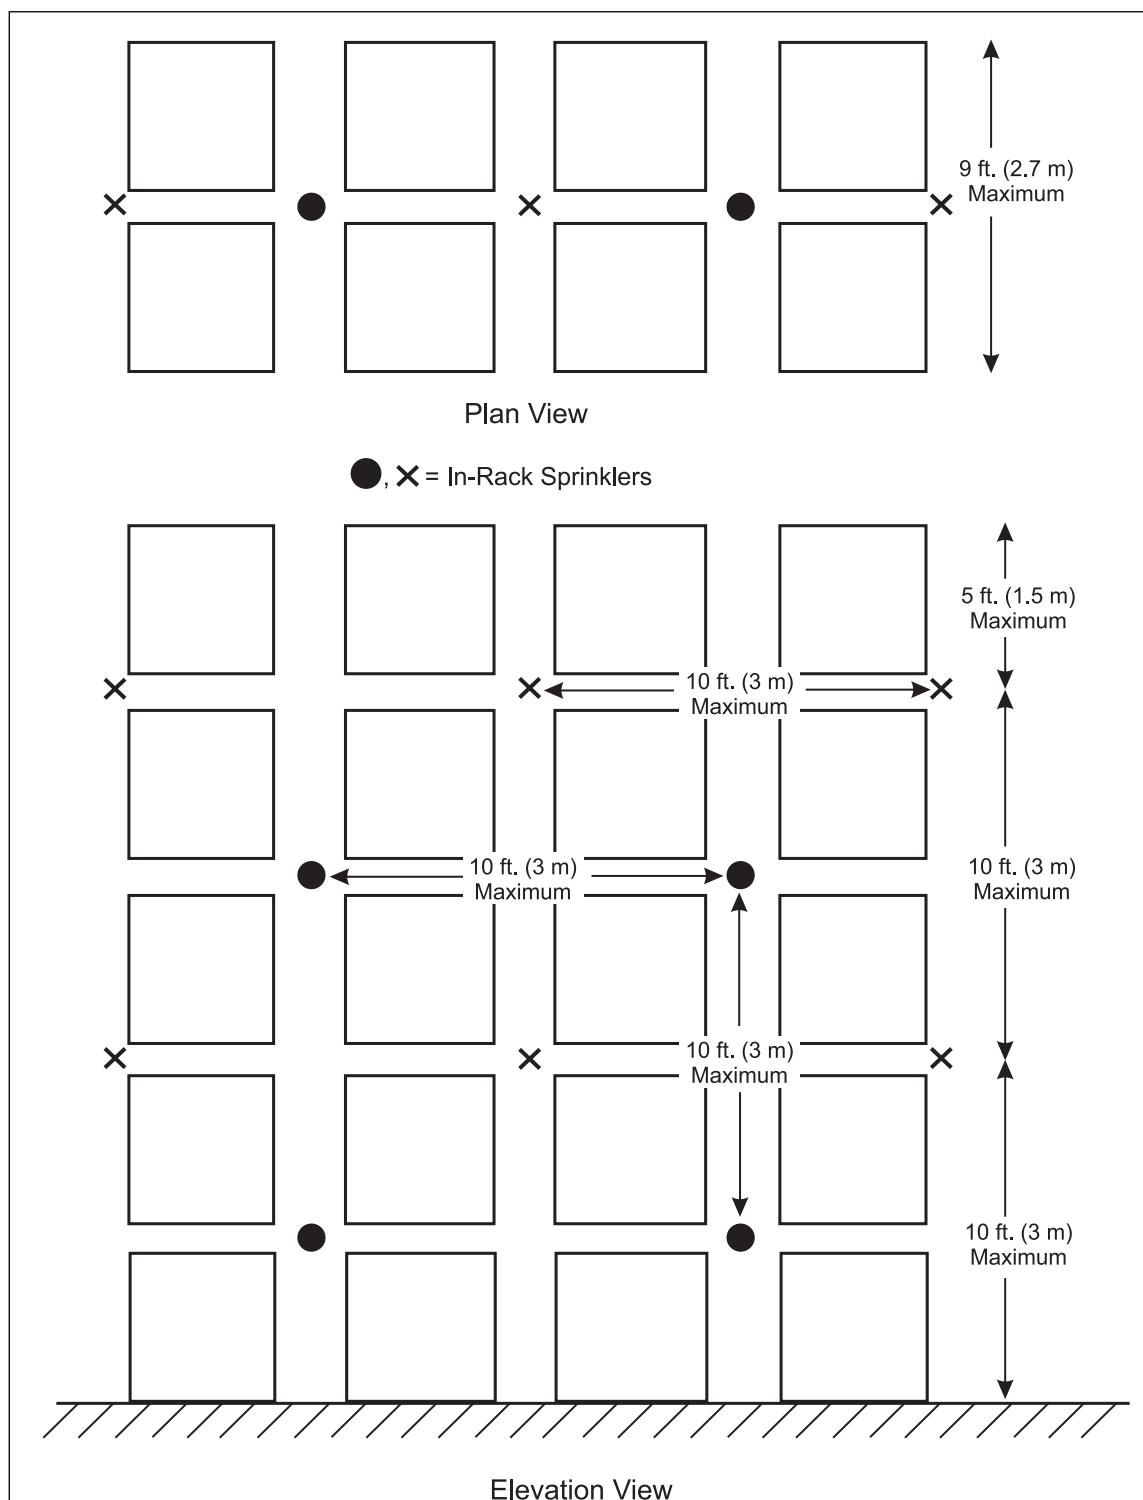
Double-row rack sprinkler layout: small metal containers (no face sprinklers)
